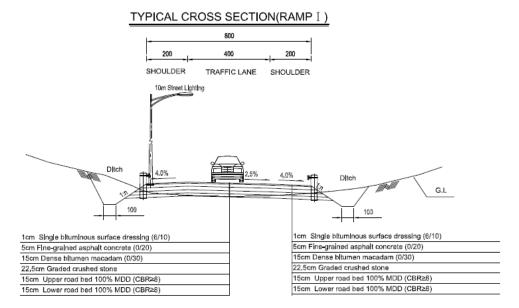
Typical Cross Section of Interchange Ramp(9m)
